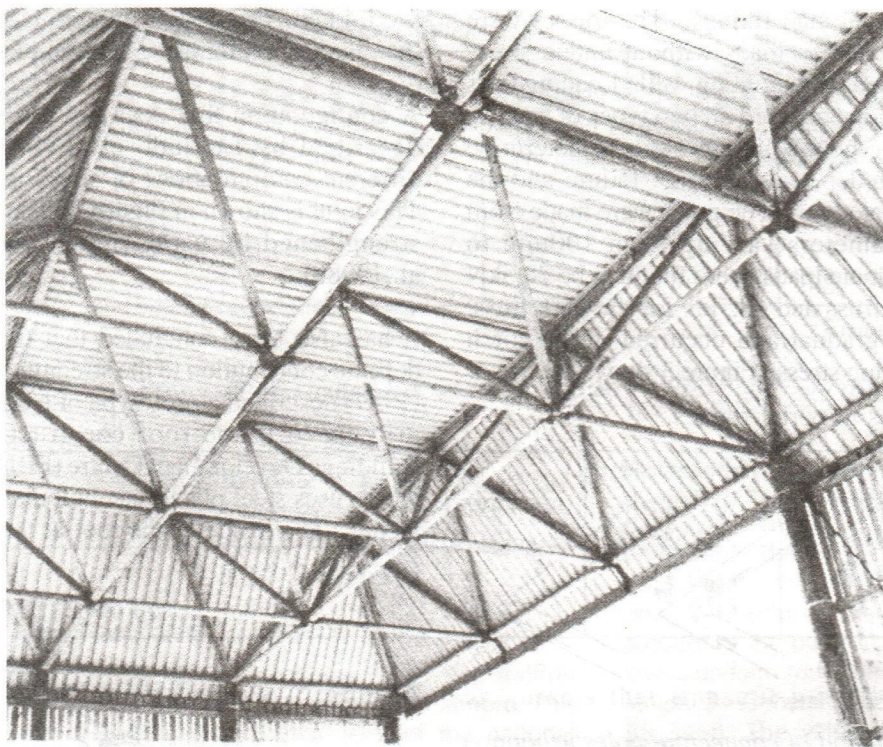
Use of the steel plate joint with wire lacing in a space roof structure
